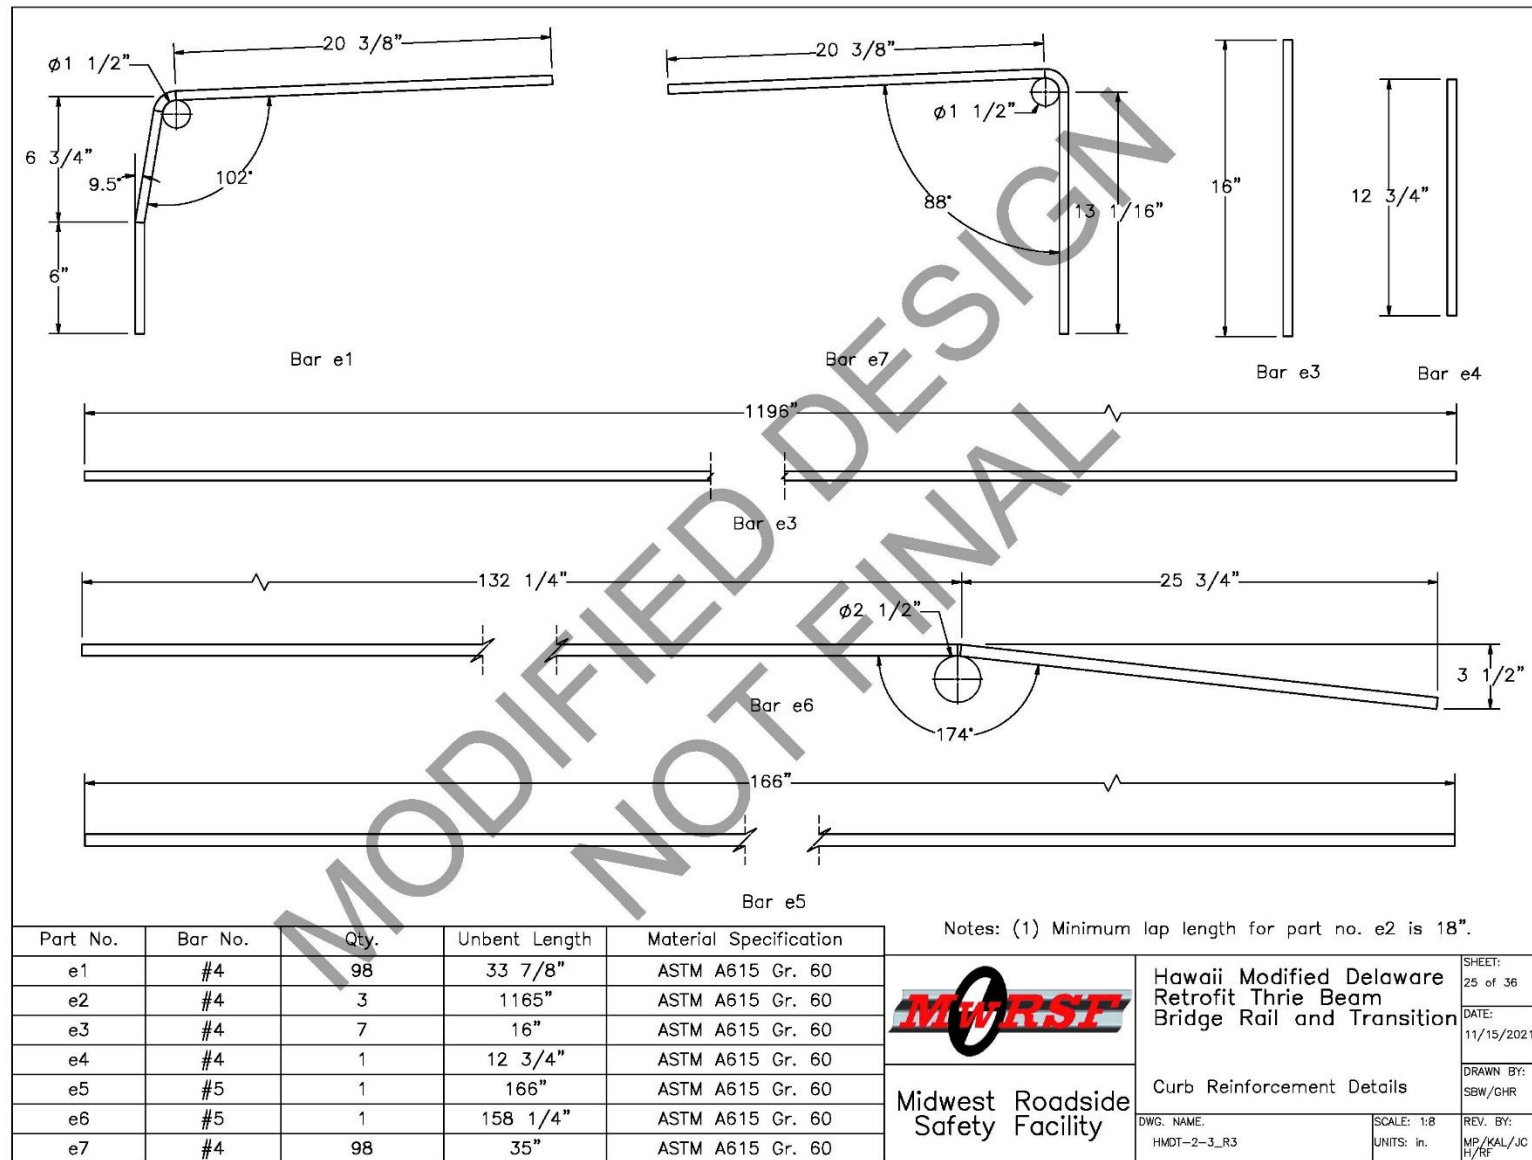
Curb Reinforcement Details, Test Nos. HMDT-2 and HMDT-3
